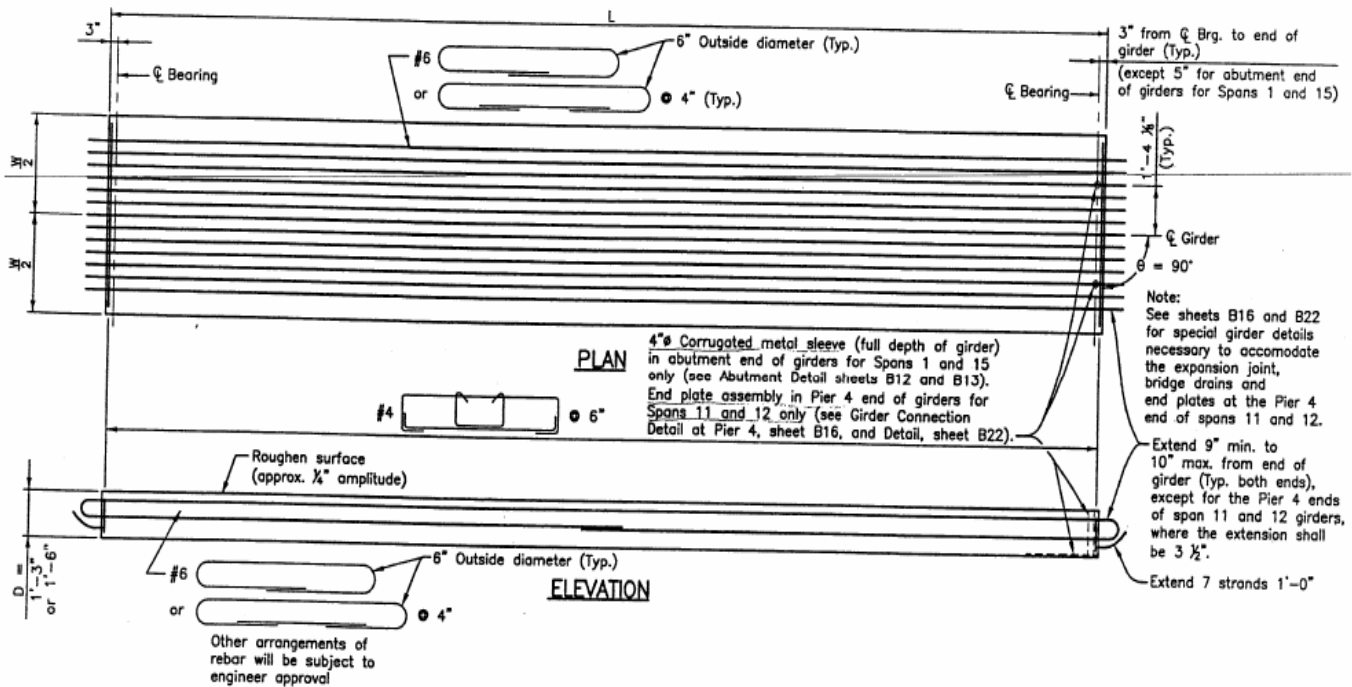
Plan view and elevation of the precast panel
